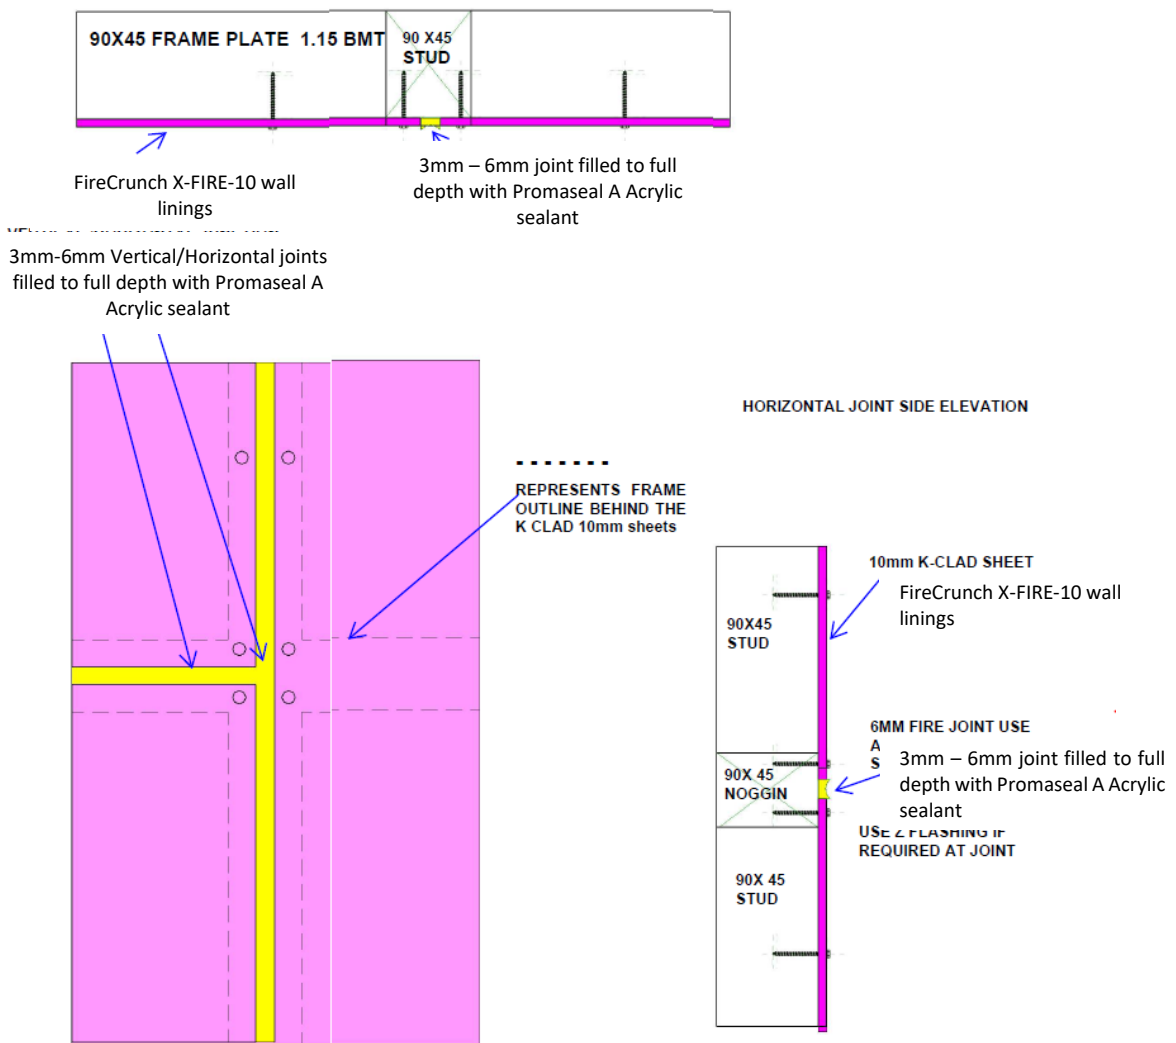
Board joint detail (FireCrunch X-FIRE-10 wall lining on the other side of stud not shown for clarify)
